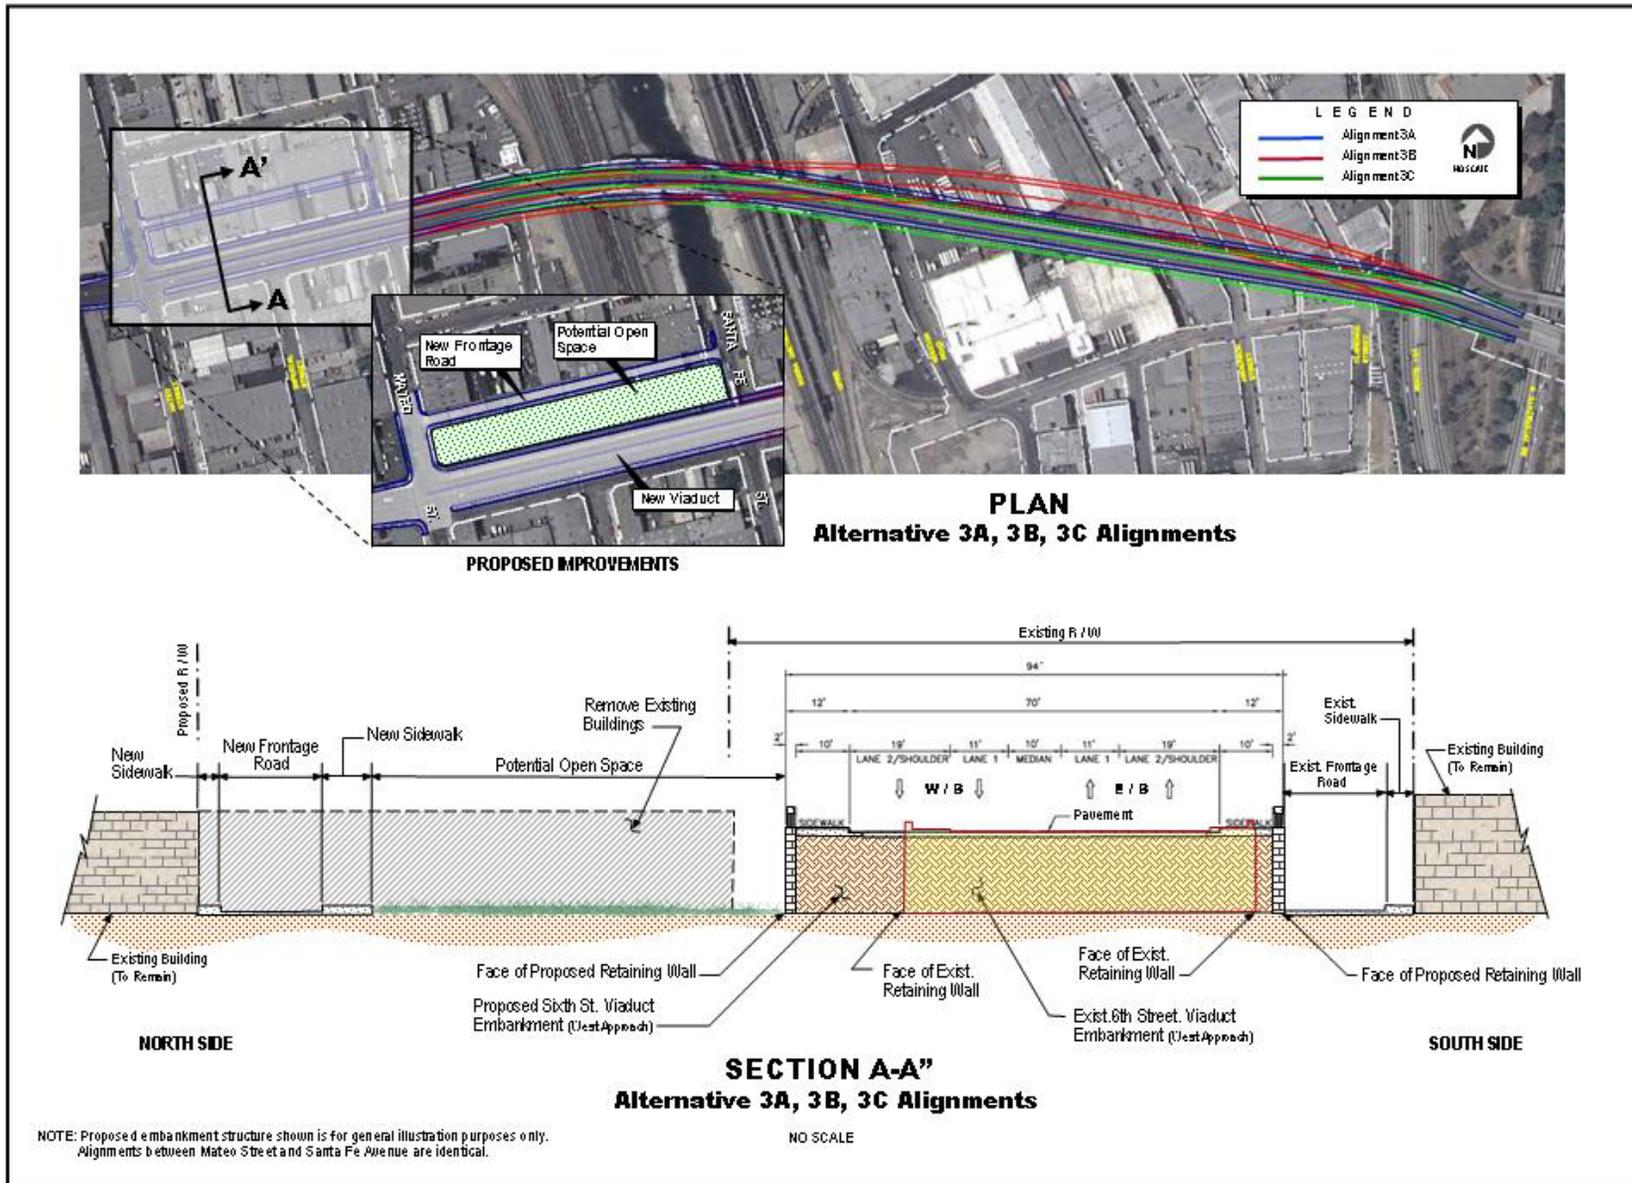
Typical Cross-Section of the Proposed New Viaduct – West Approach
